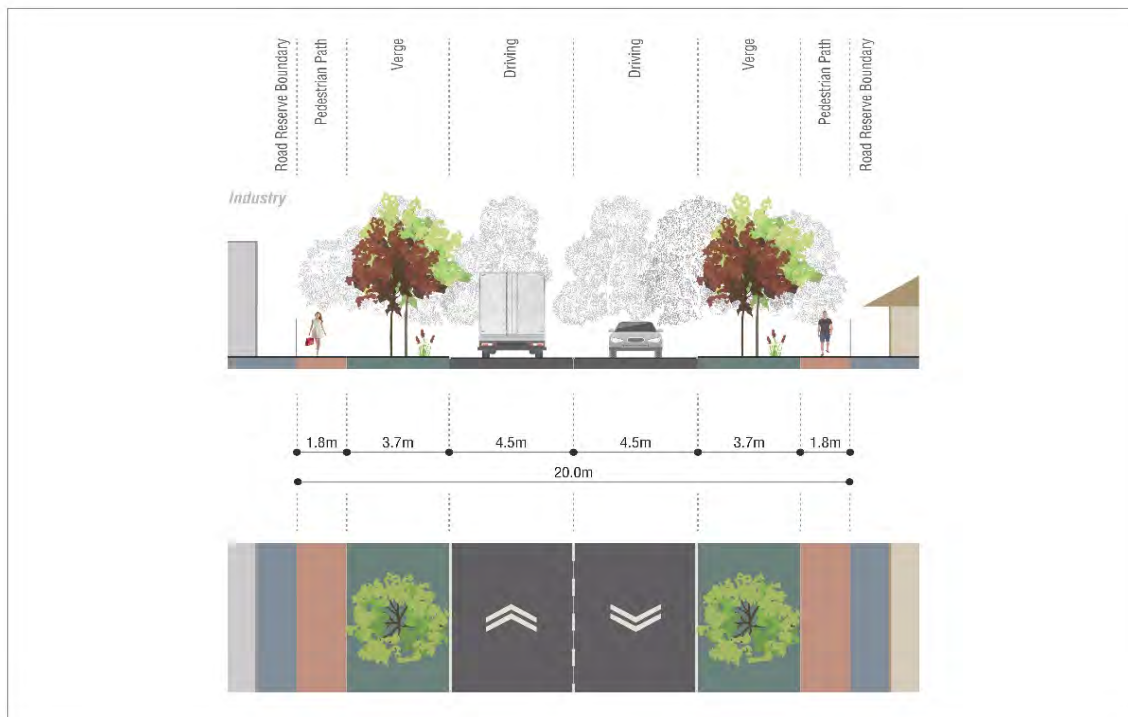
Sultana Road West (East of Milner Road) Cross Section
